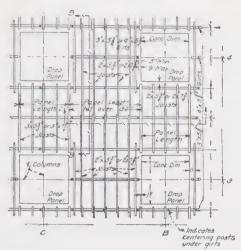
Flat slab floor forms for interior floor bay. Top view.
